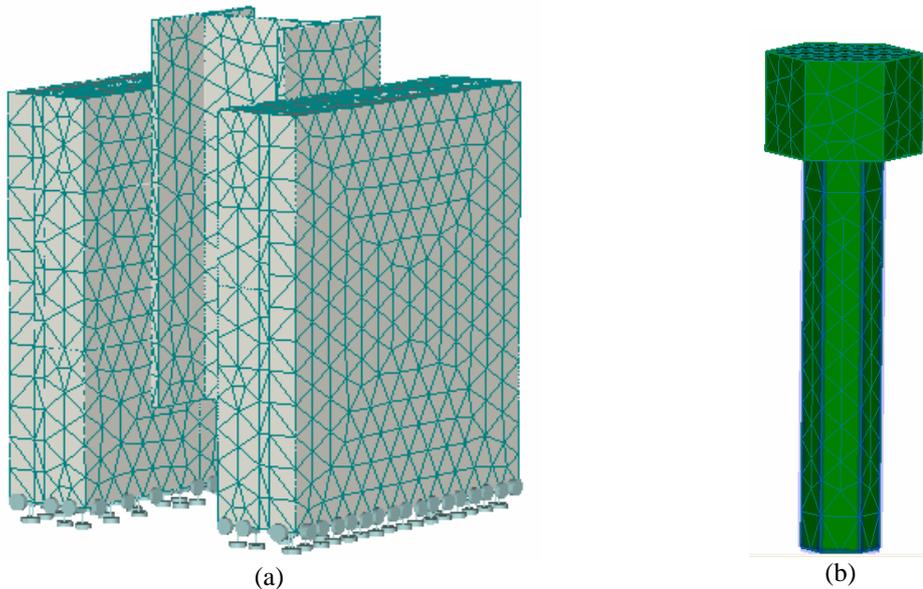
Finite element mesh: a) slab concrete and steel beam ; b) stud
